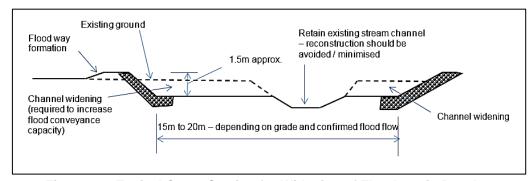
Typical Cross Section for Widening of Floodway in Reach 1
